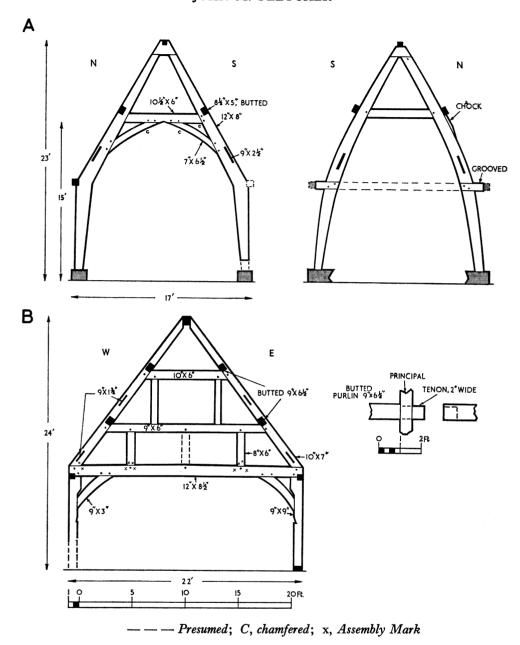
Middle Farm, Harwell. (a) Cruck Outhouse. Left, central truss; right, partition truss. (b) Thatched Outhouse. Section through Truss II and detail of butted purlin.
